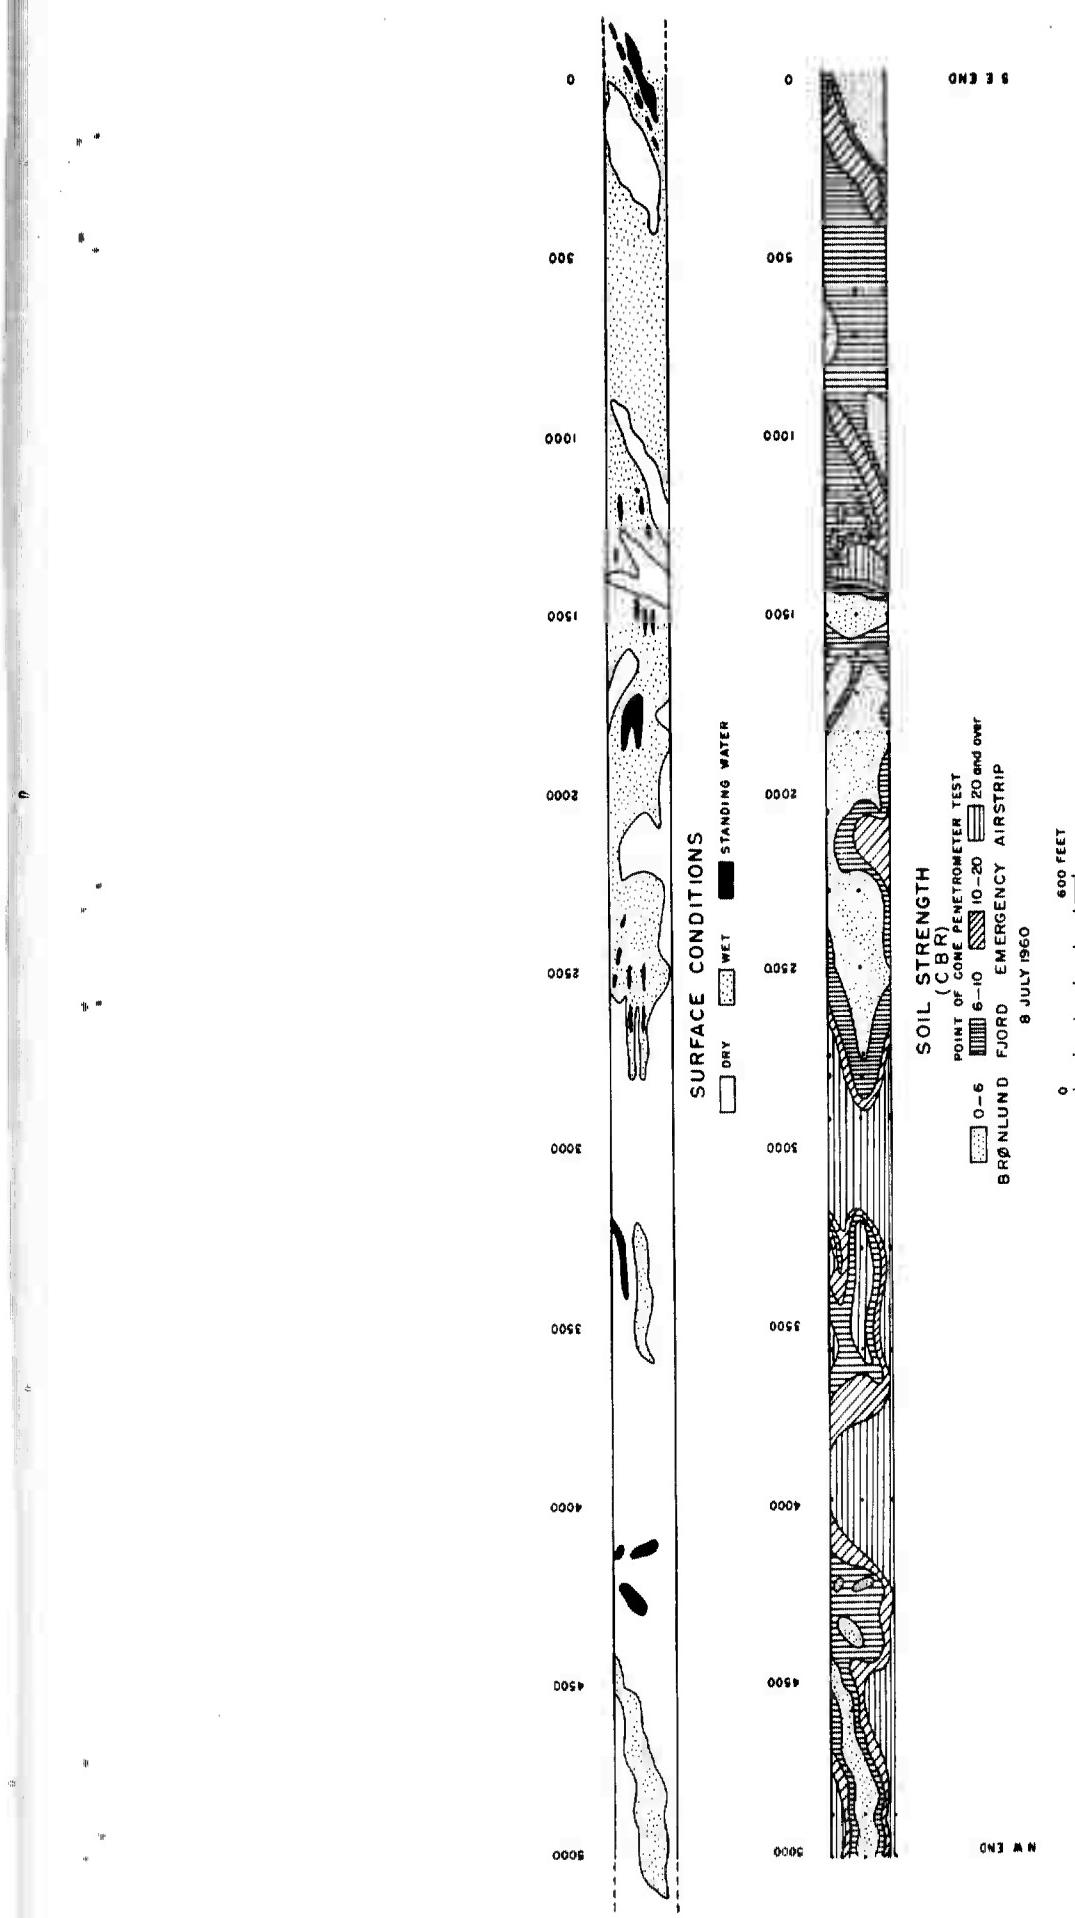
Plan of runway at Brønlund Fjord showing strength of soil and surface conditions.
